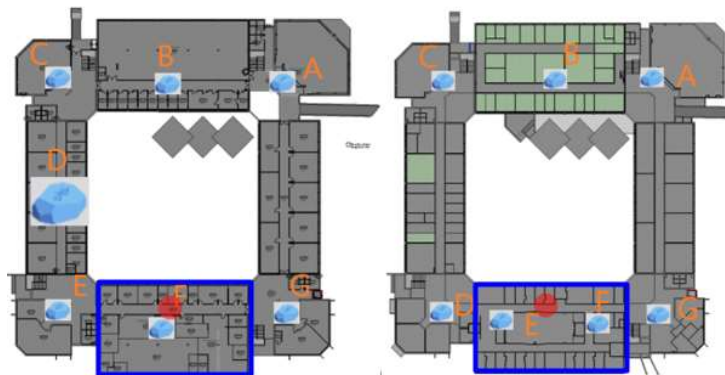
Test case 4 layout. Floor 1 (left) and Floor 2 (right).
